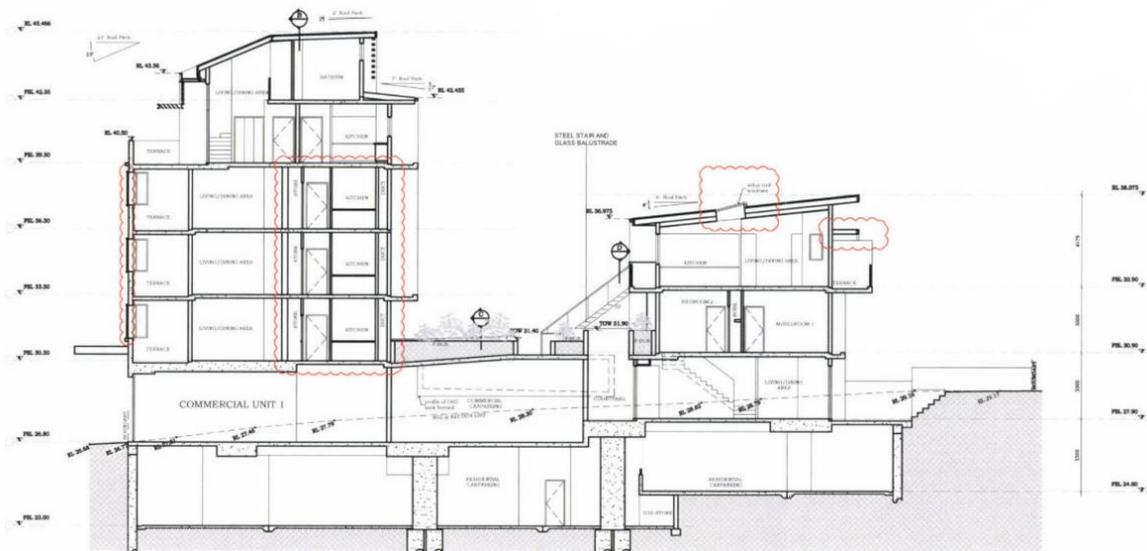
No. 483-485 – approved section plan – DA/732/2010/A (Source: RCC)
